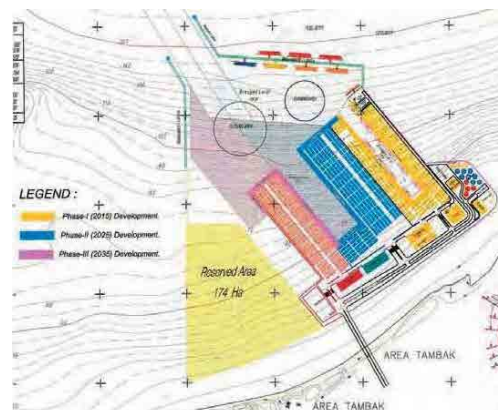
TIC Port Plan on Tangerang Coast
